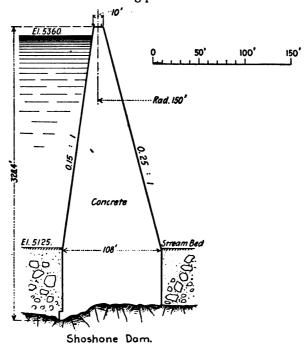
Section of Shoshone dam, Arch Wyoming; built 1903 to 1910; rubble concrete masonry; length 200 ft.; max. height 328 ft.; contains 75.534 cu. yd.
